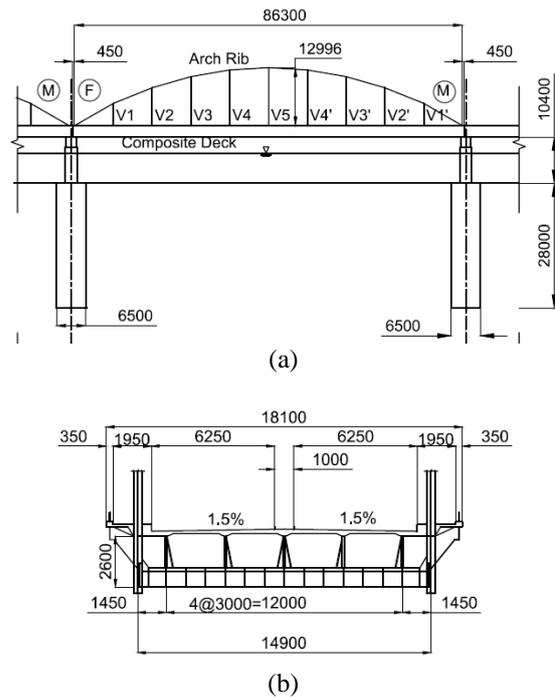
Studied Langer-type arch bridge constructed in 1971: (a) elevation of bridge; (b) section of the deck. (Unit in millimeters)
